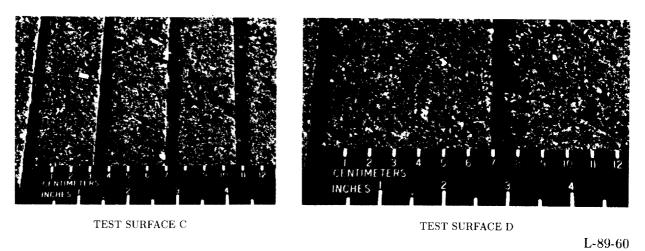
Close-up photographs of grooved test surfaces C and D on runway 13/31 at FAA Technical Center airport.
